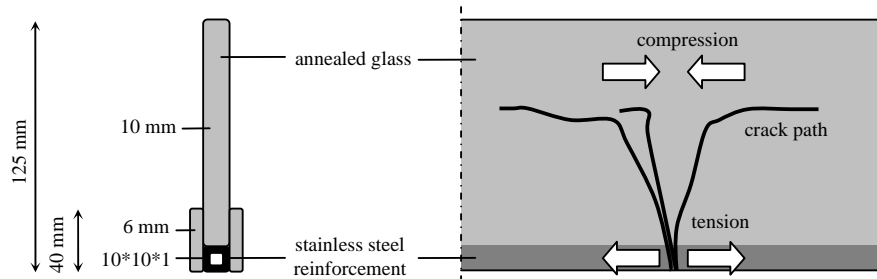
Schematic cross section and side view (at cracked stage) of reinforced glass beam specimen
